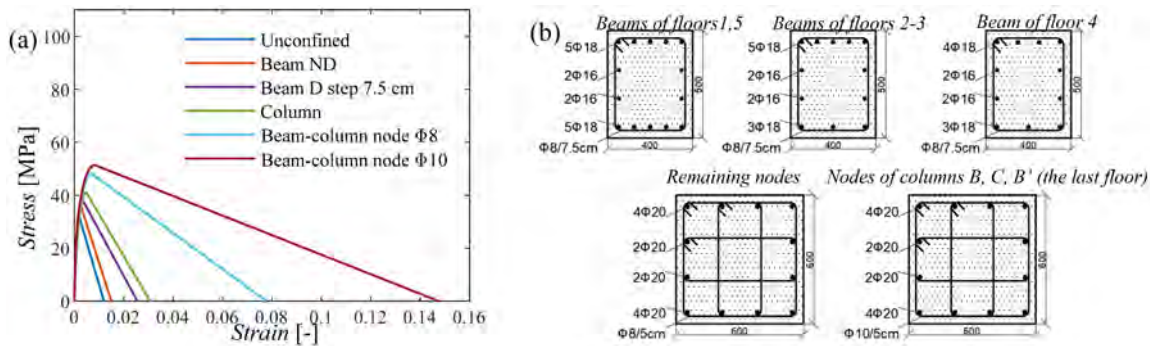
$CPE + springs + rebars$  model: (a) Constitutive laws of concrete in compression; (b) longitudinal and transverse reinforcement of the dissipative area of the beams in the cross-sections of Figure 3a and in the beam-column nodes.
